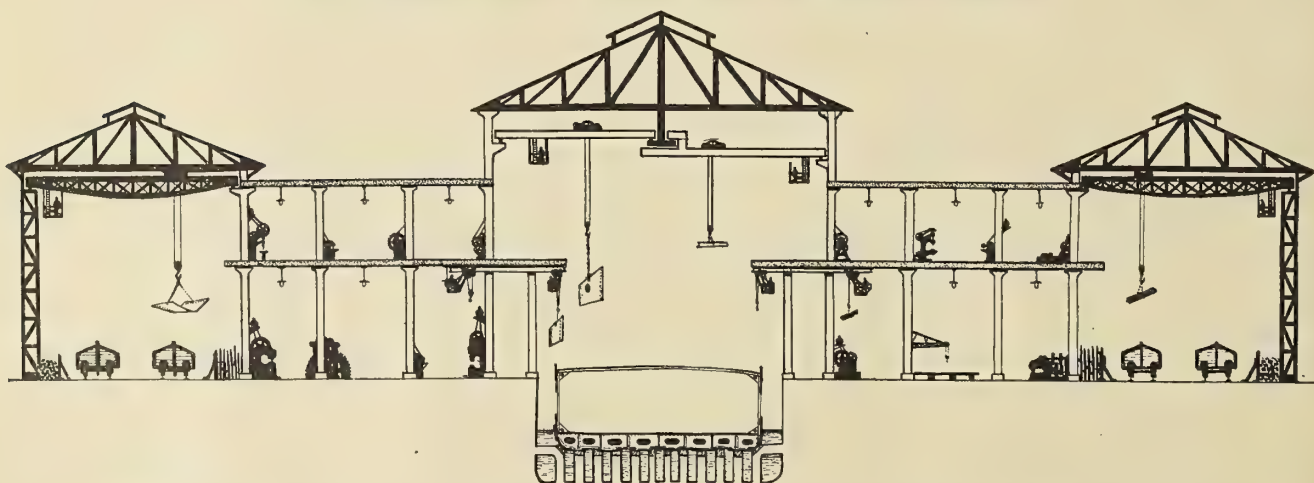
Section Through Yard at First Stage, Showing Material Storage Space, Fabricating Shops and Building Berth
